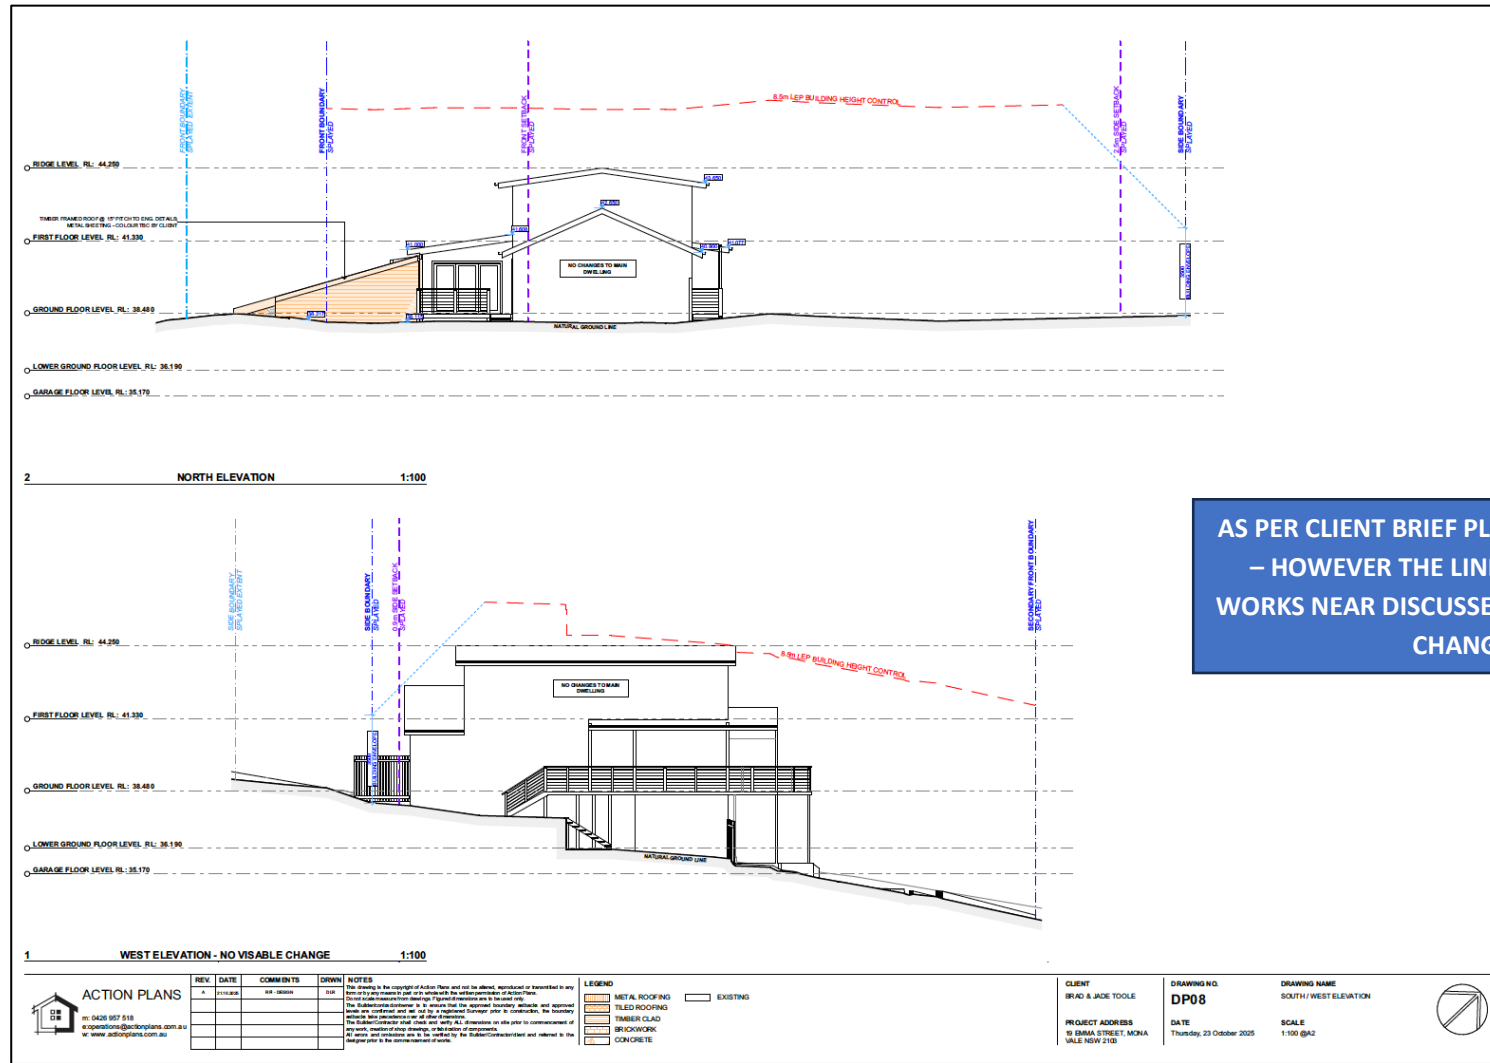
PROPOSED SOUTH / WEST ELEVATION
